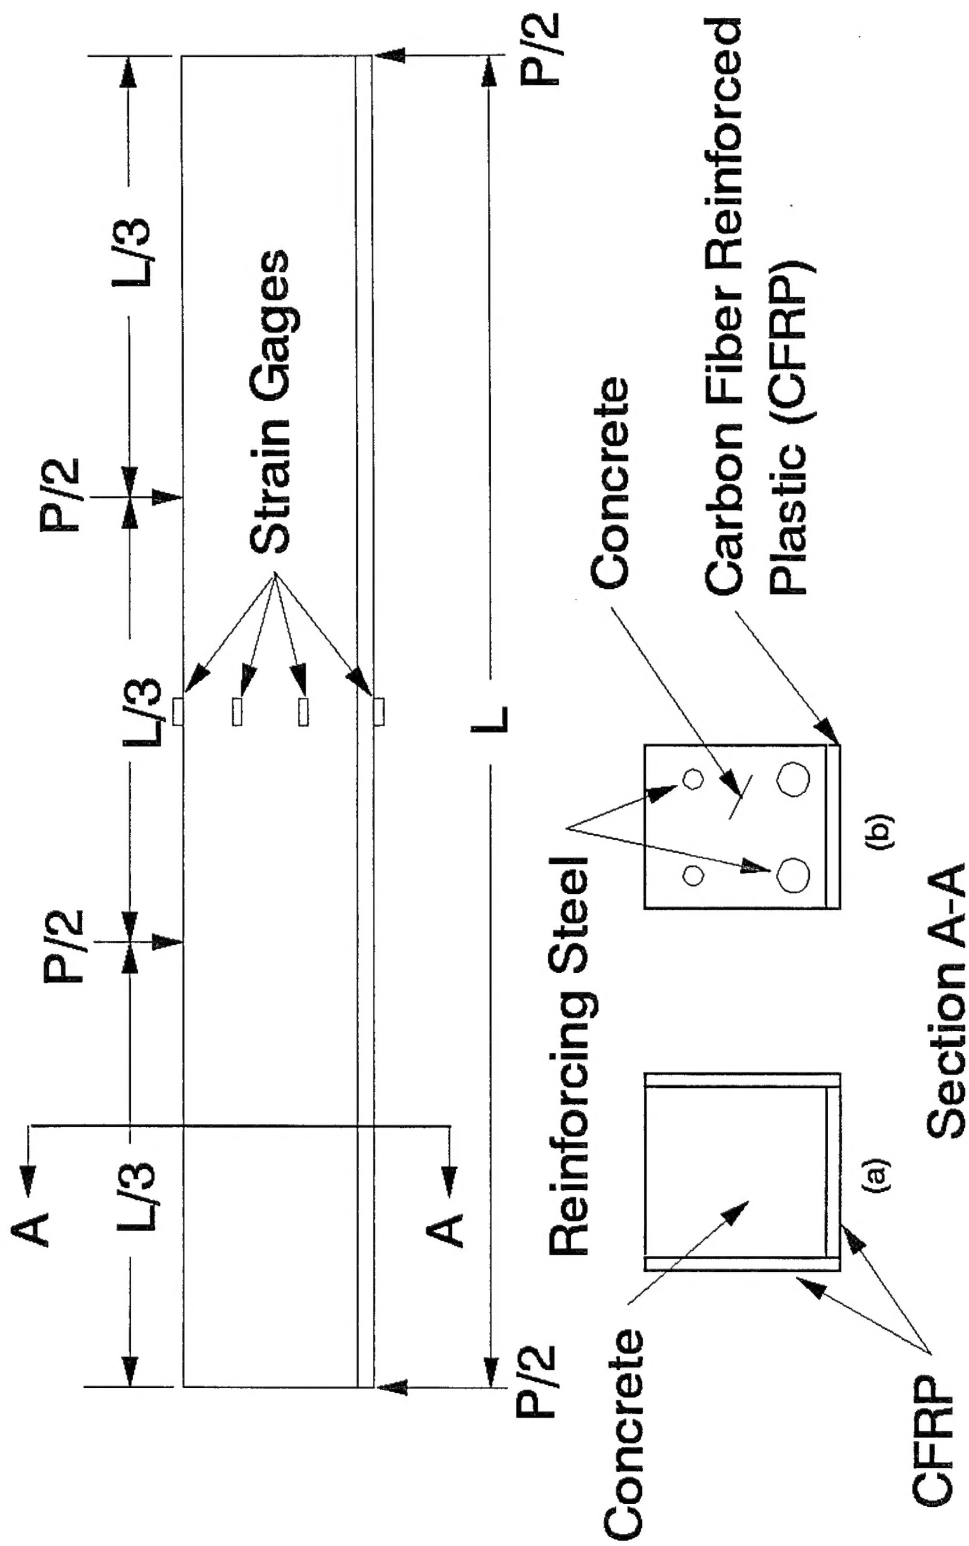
Tension Reinforcement of Concrete Beams Using CFRP.
